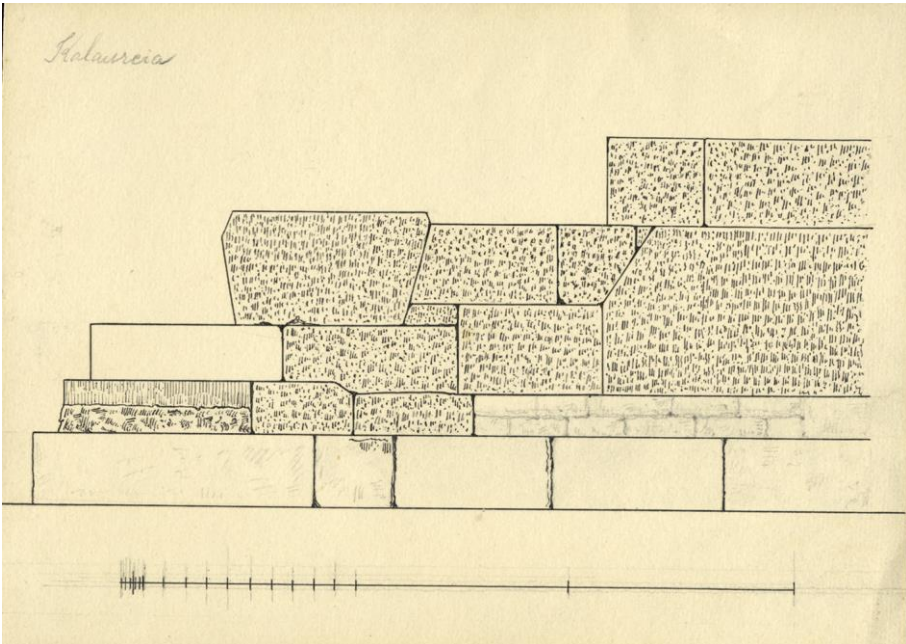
Kristenson's drawing of the wall segment from the photograph in fig. 50. Photo: Sven Kristenson's archive, LUB.
